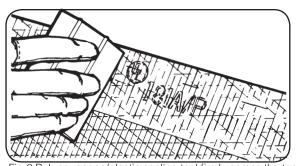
Rub squeegee/plastic sealing tool firmly across the tape surface removing air bubbles and folds until the the facing reinforcement shows clearly through the tape. Avoid puncturing or tearing the tape.
